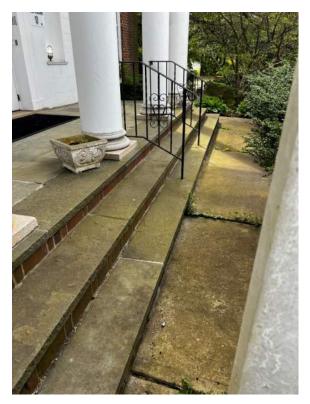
IMG_1156 – North Façade – Main entrance and acting egress door exits is not ADA accessible. Non-compliant handrails, riser and tread heights, and does not contain a ramp.
